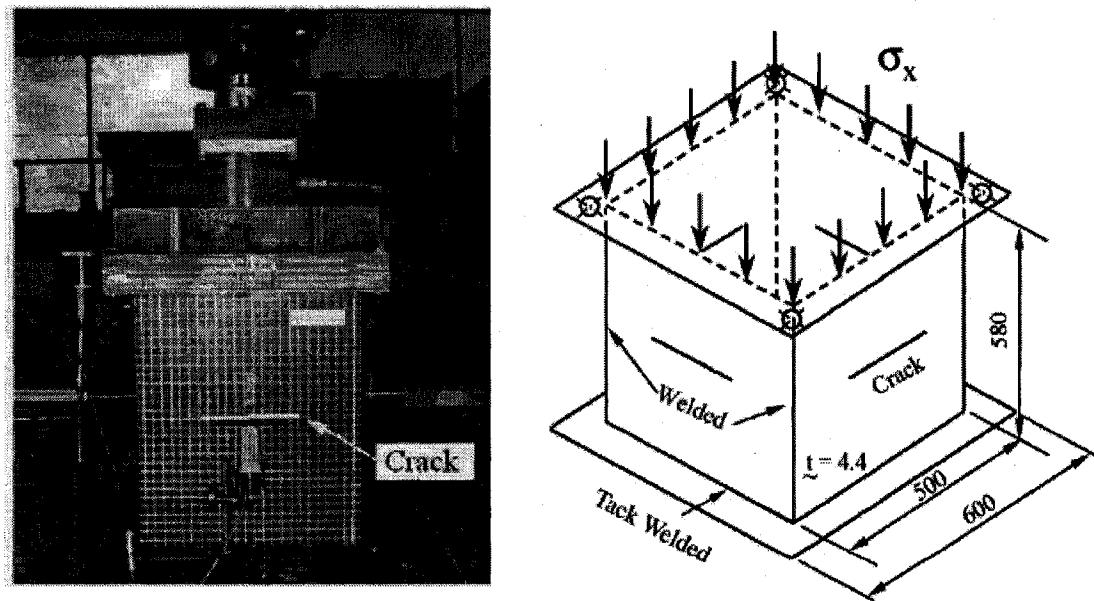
The test set-up and the schematic view of the test structure with crack damage under axial compressive loads
